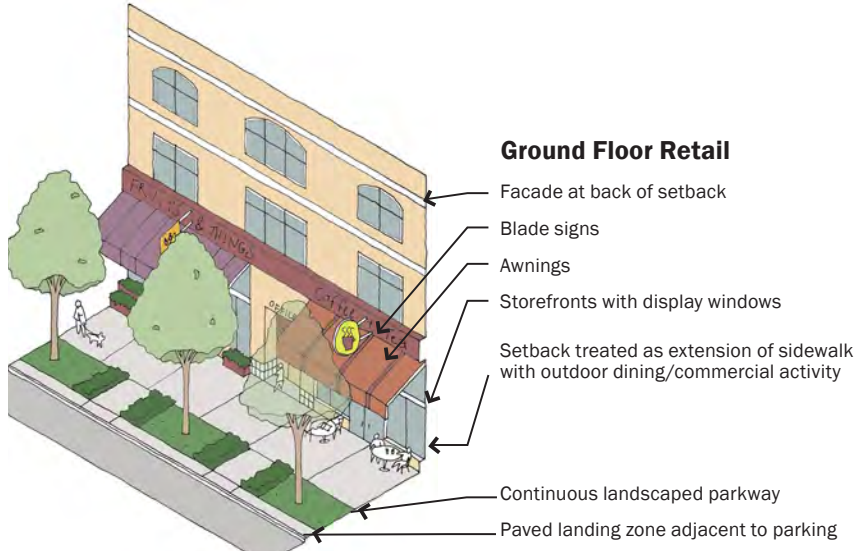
Sidewalk and setback treatment on new private streets also varies with ground floor treatment.
